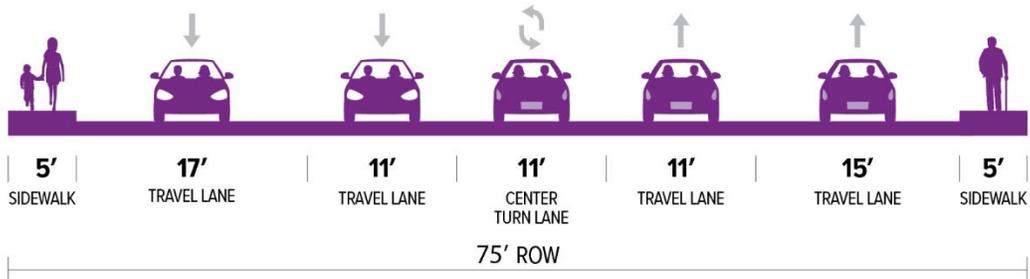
Segment 2: Norwood Avenue (Bell Avenue to I-80)
